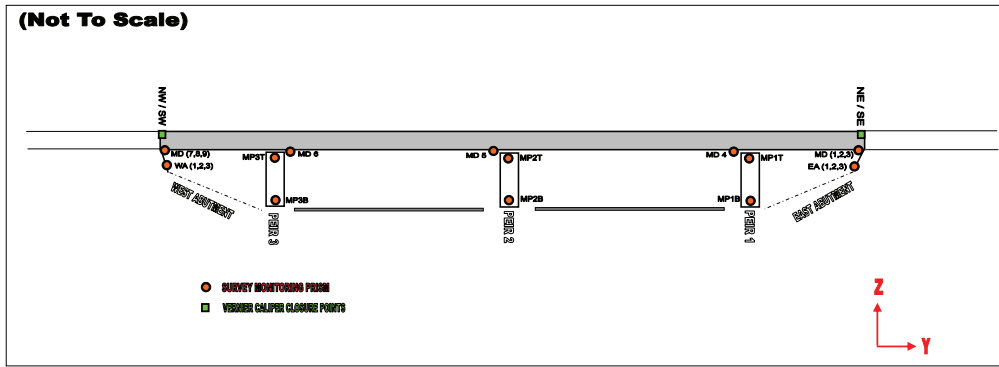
Elevation of the relative 3D monitoring points on Moreton Park Road Bridge (South)
